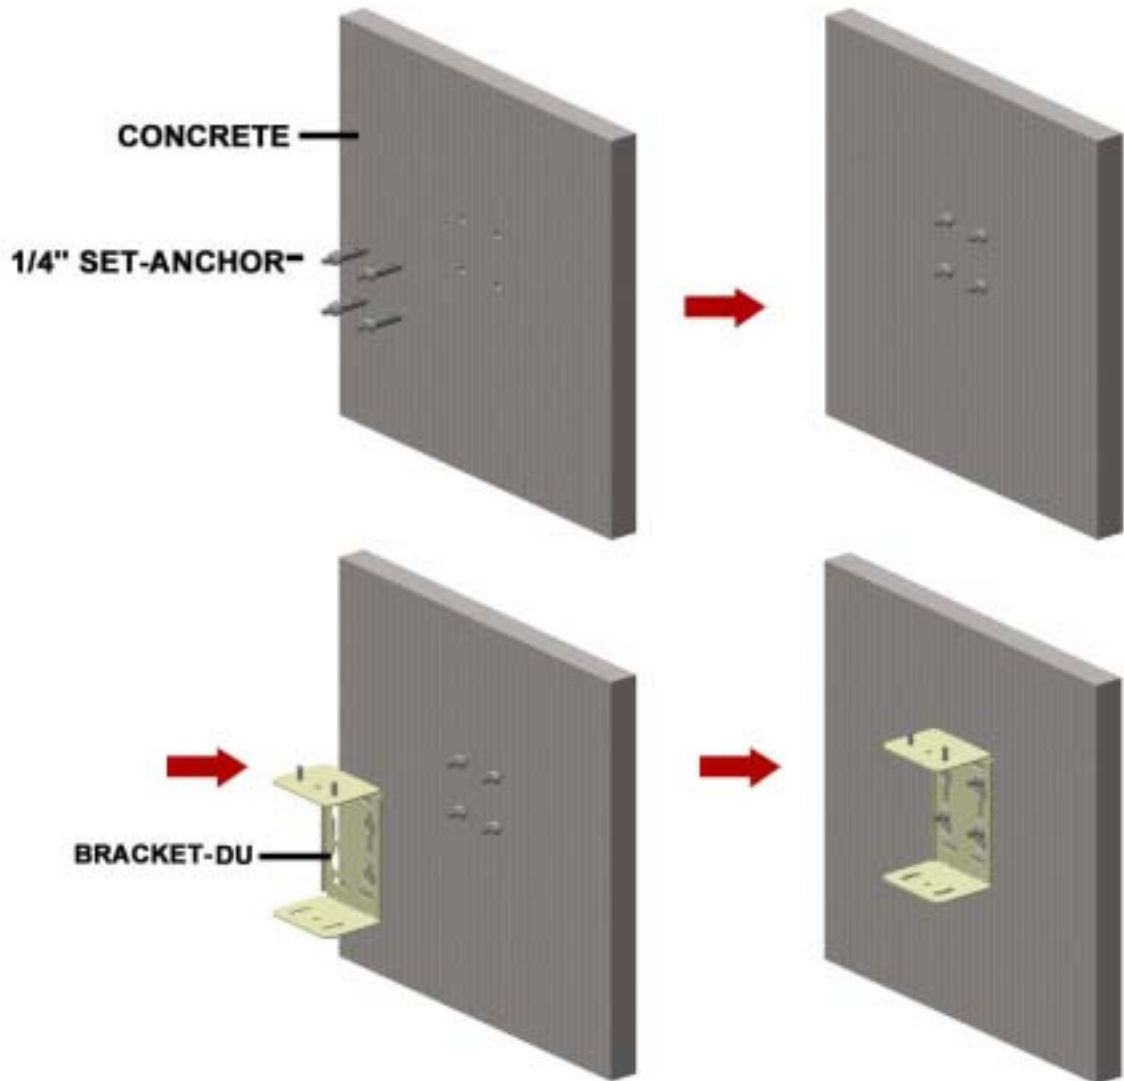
CONCRETE WALL MOUNTING MTG BRACKET-DU Connection Sequence
